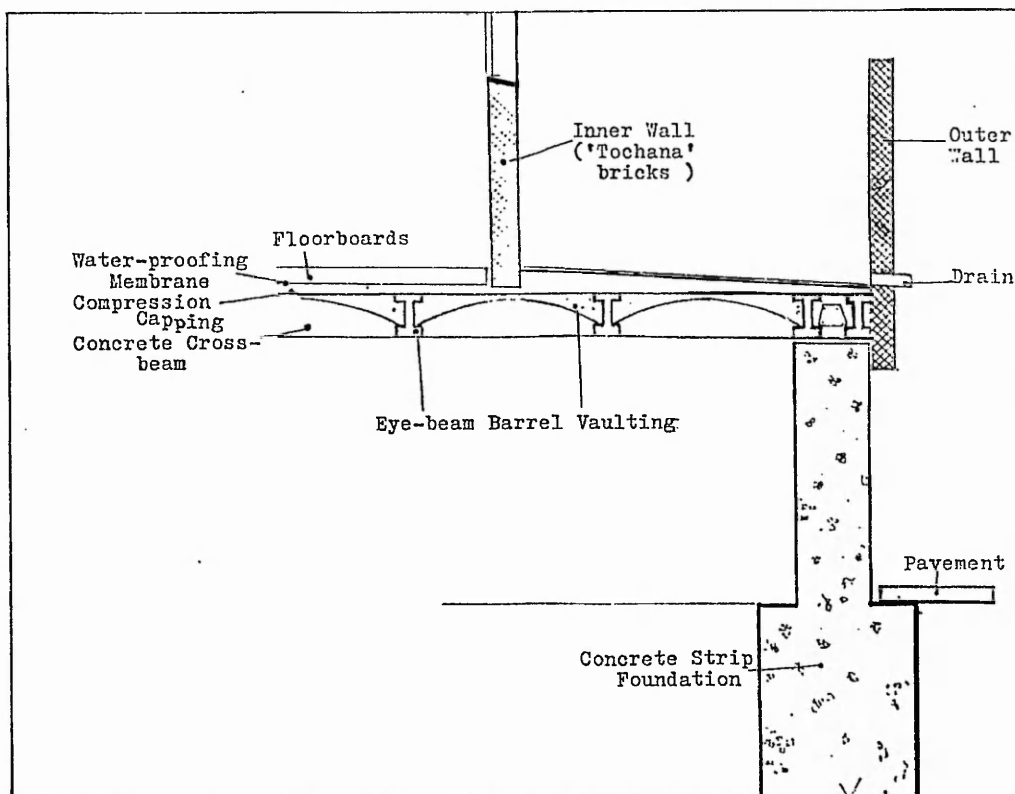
Detailed Elevation of Foundations and Walls sent to Prat Council by SHA, April 1965.
